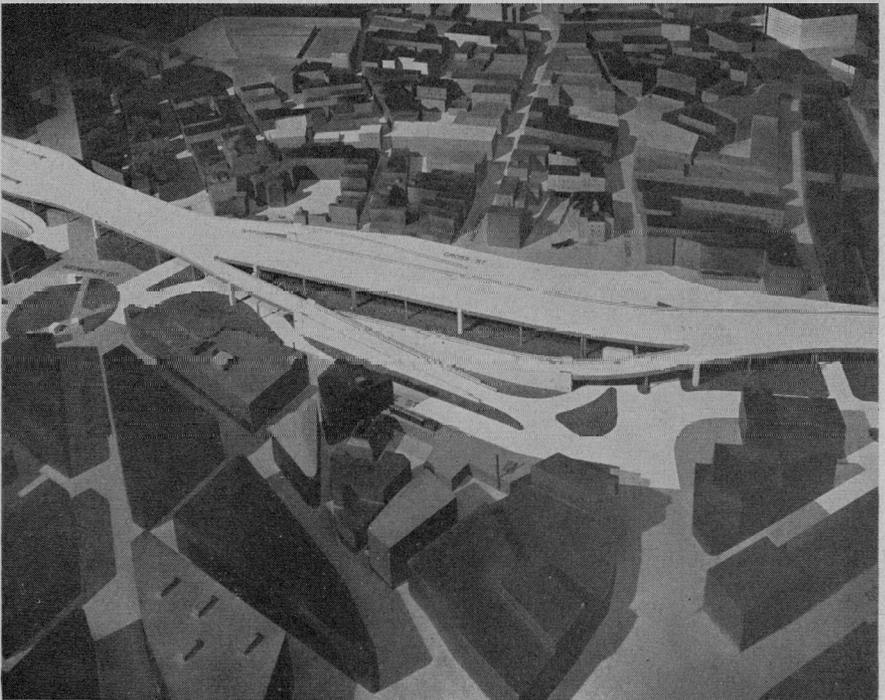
PORTION OF SCALE MODEL SHOWING ARRANGEMENT OF RAMPS NEAR ENTRANCE TO SUMNER TUNNEL.
